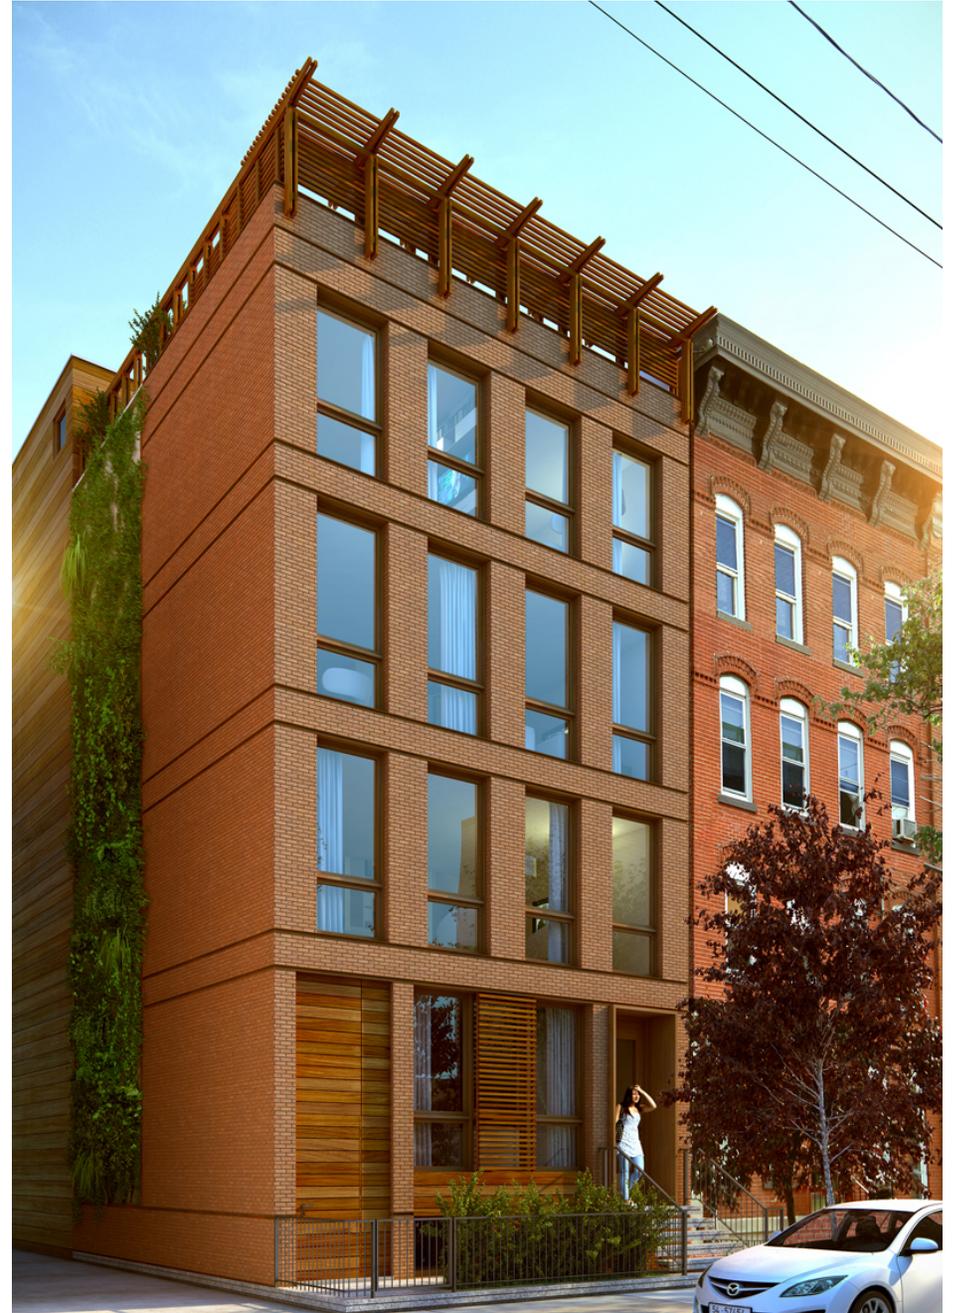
New construction with contemporary, yet compatible, references to historic building elements (Source: Jorge Mastropietro Architects Atelier)
